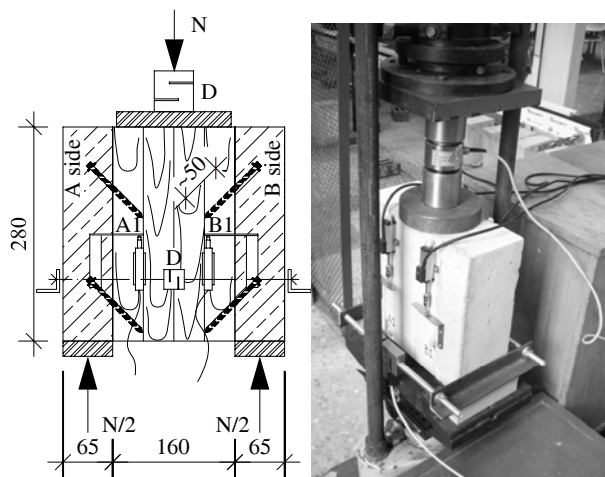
Specimen set-up (left) and view on the specimen in the loading machine (right)
